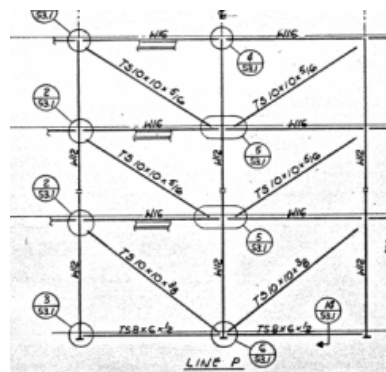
Frame Elevation (83CA3A--P-1415-3)
